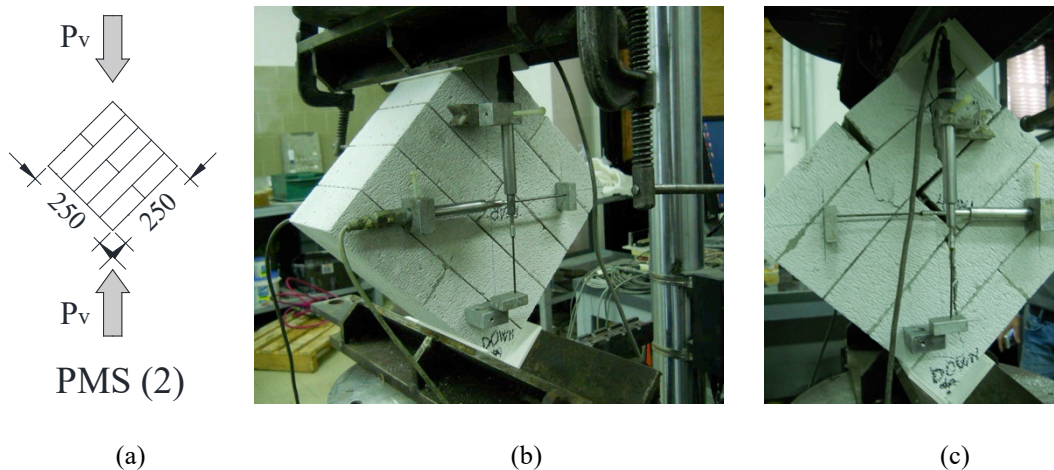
(a) Sketch and (b) adopted arrangement of diagonal compression tests on small AAC masonry panels PMS; (c) observed failure mode.
